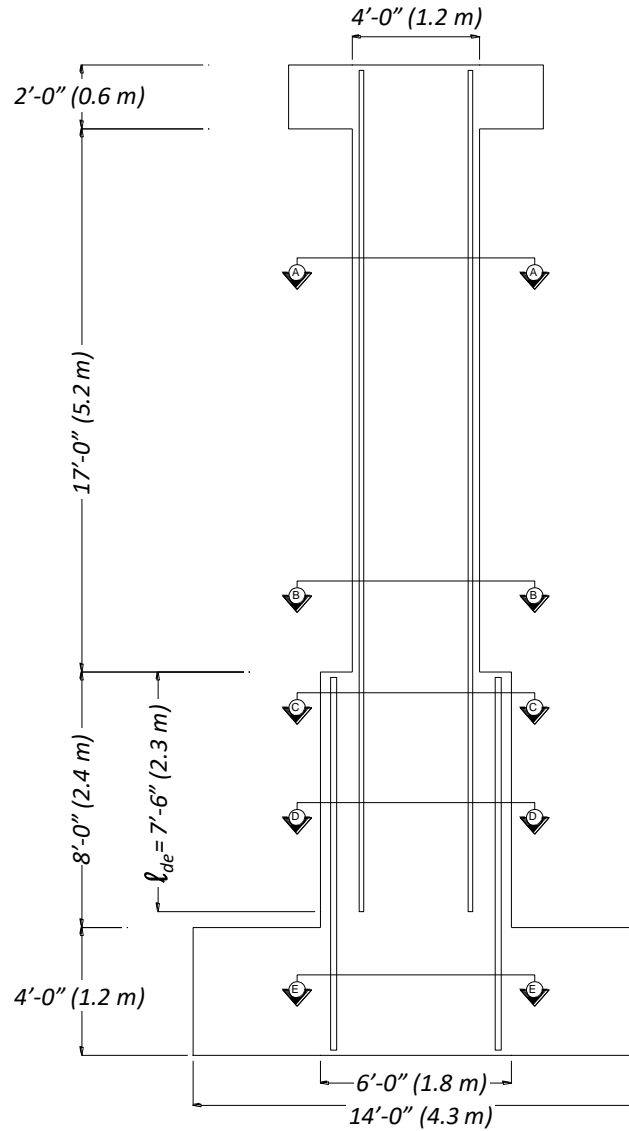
General Dimensions of Test Specimen (Elevation View)
